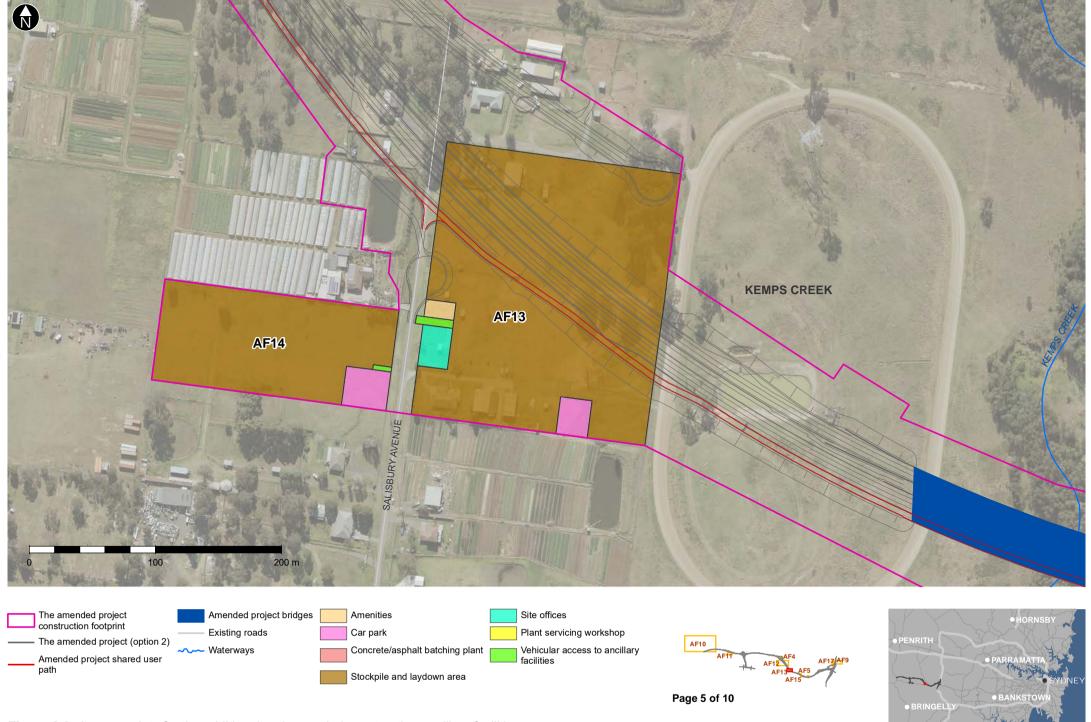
Access points for the additional and amended construction ancillary facilities
